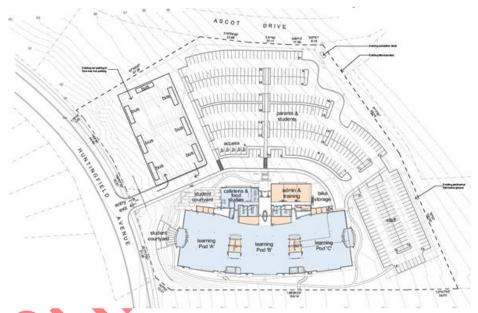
Proposed Site Plan (Source: submitted by applicants)
